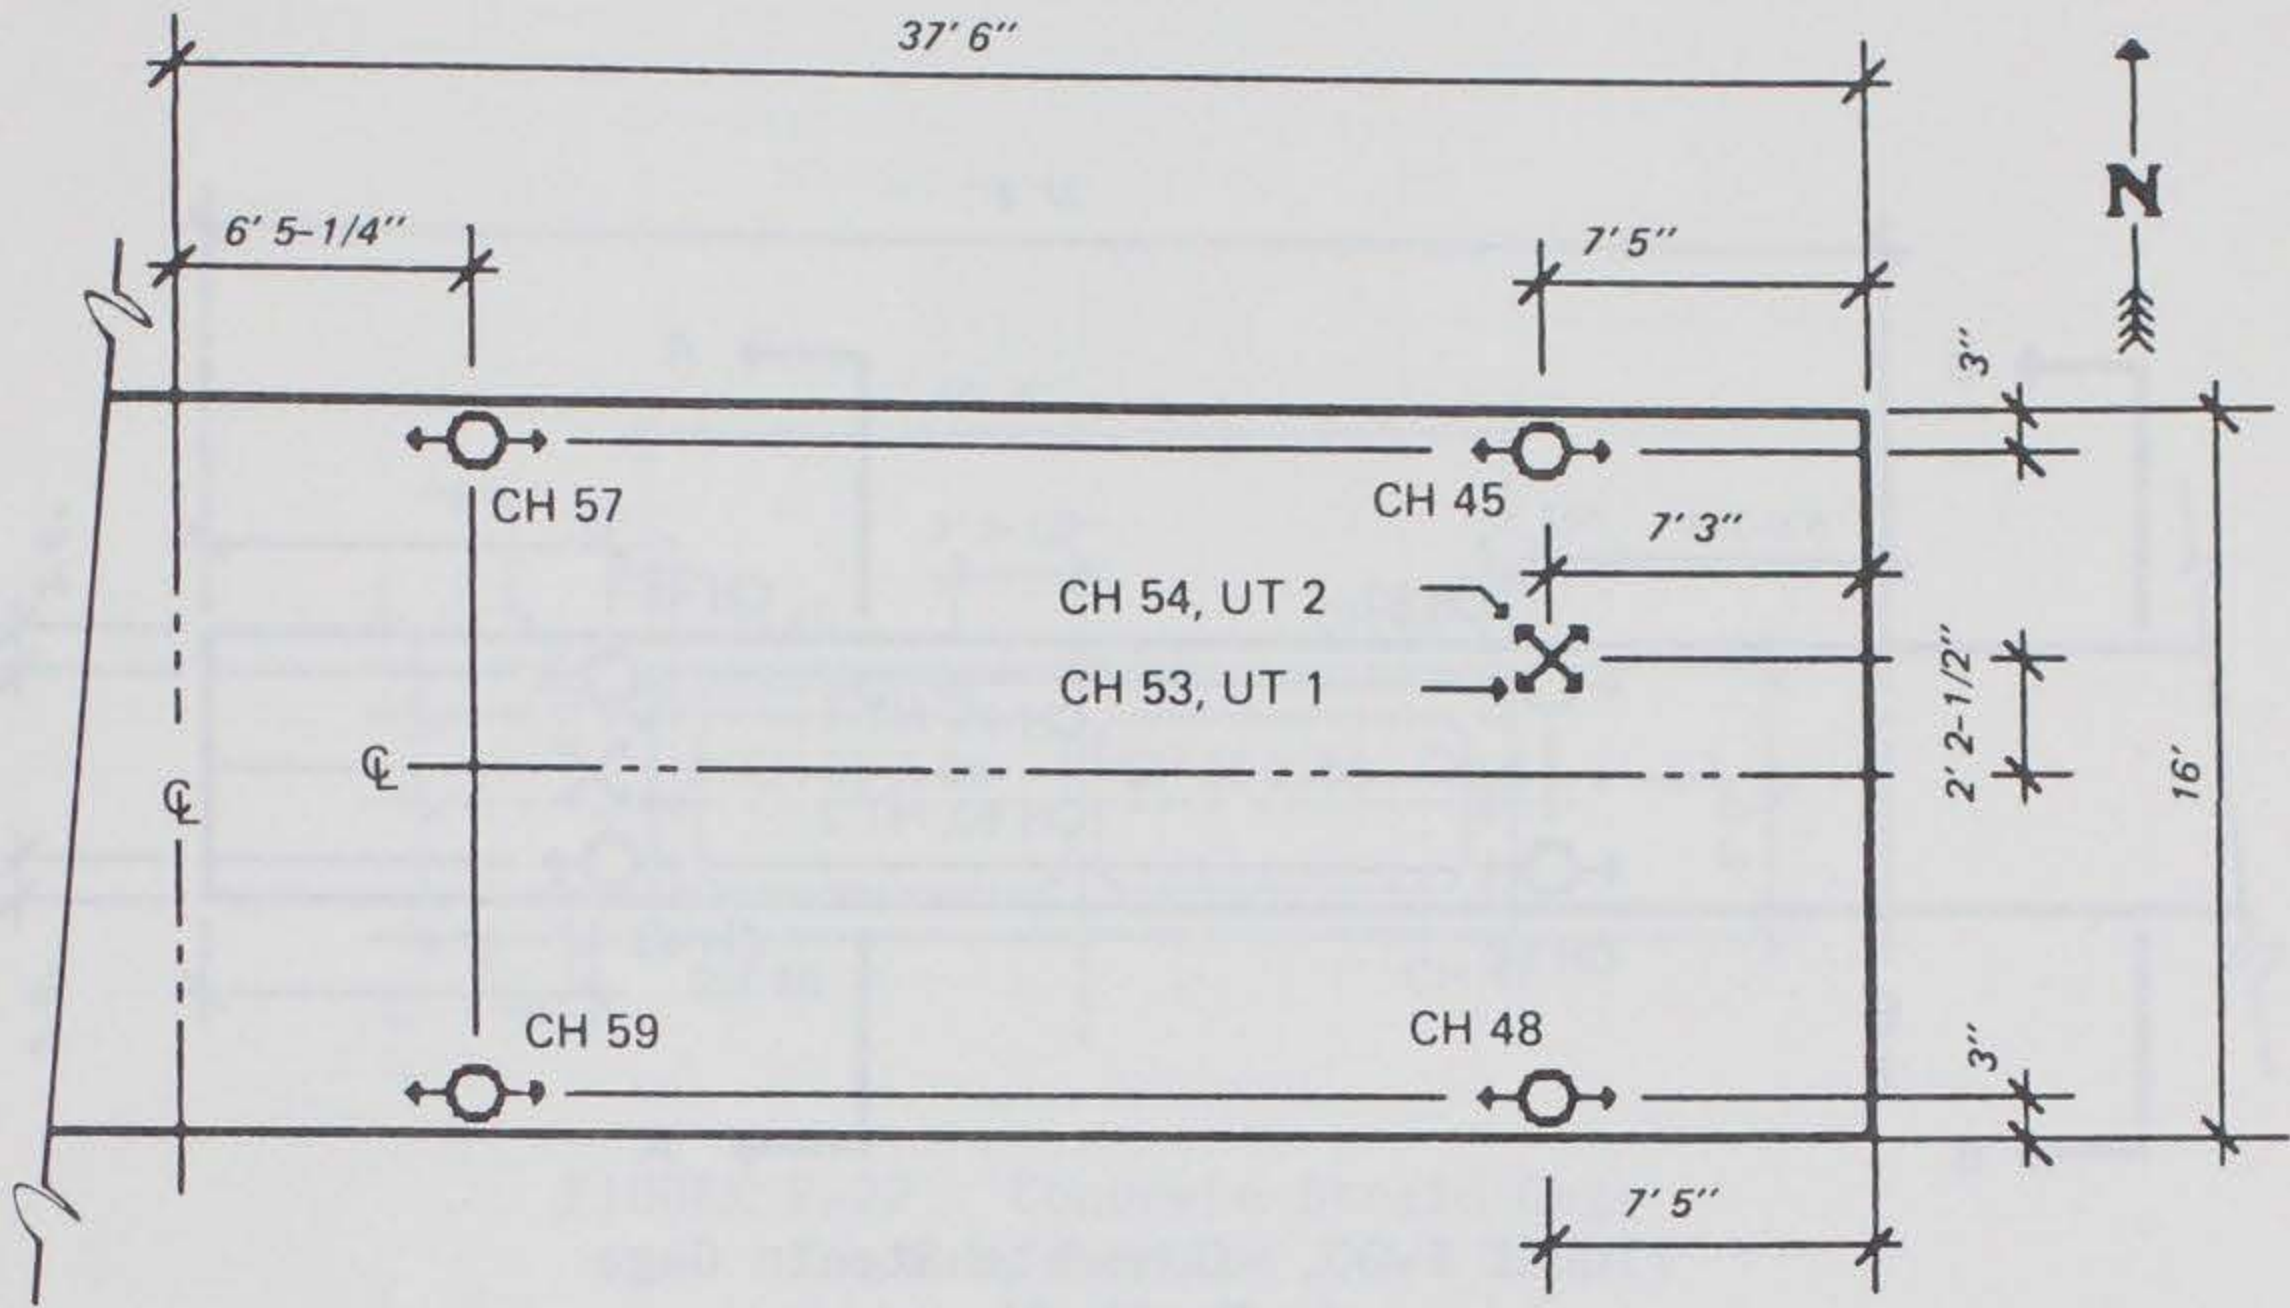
Concrete Strain Gage Layout, Top Plan
